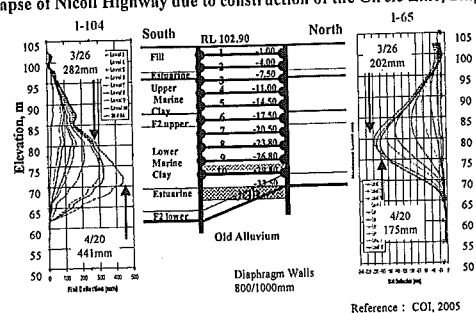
Ground conditions and retaining system at the MRT site next to Nicoll Highway, Singapore
